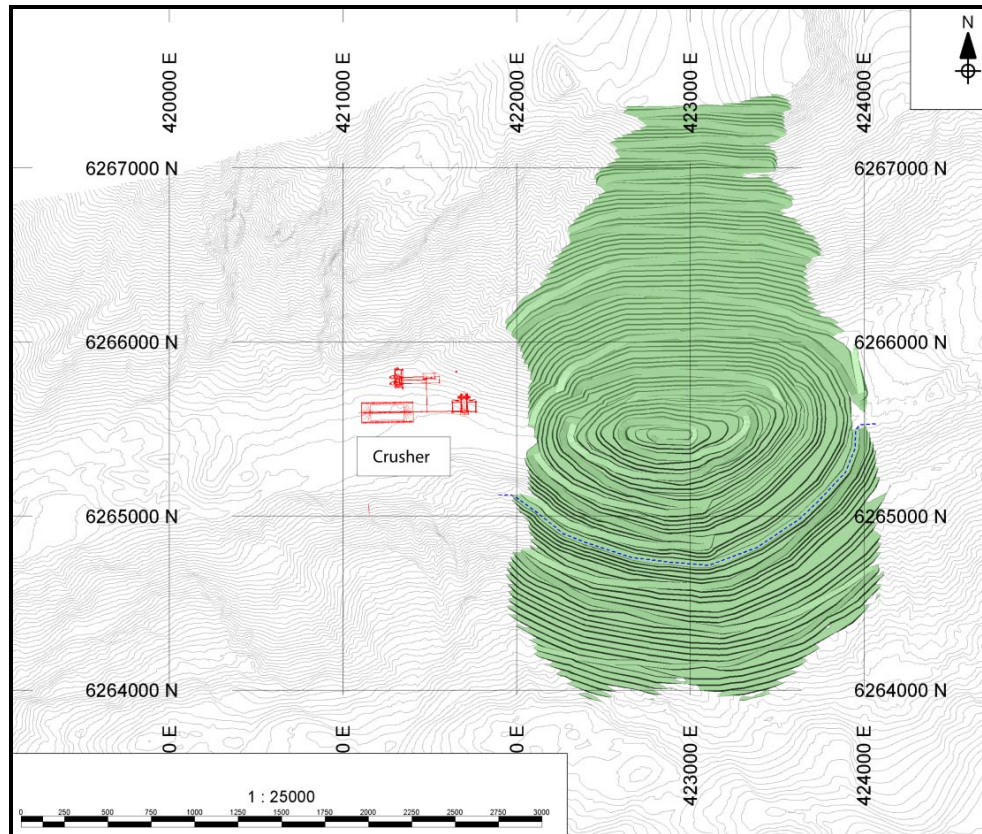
Plan View of Mitchell Pit M623iMITCHELL PHASE M624i
